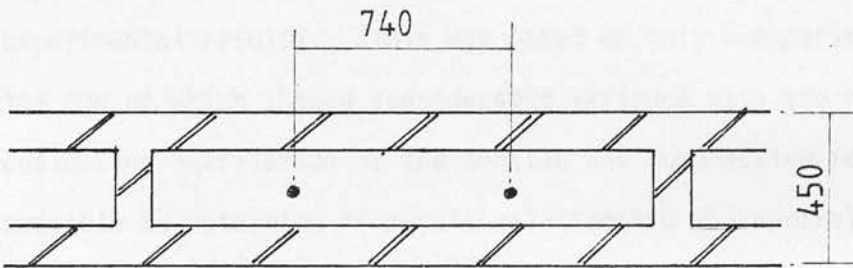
Diaphragm wall section<sup>(9)</sup>
